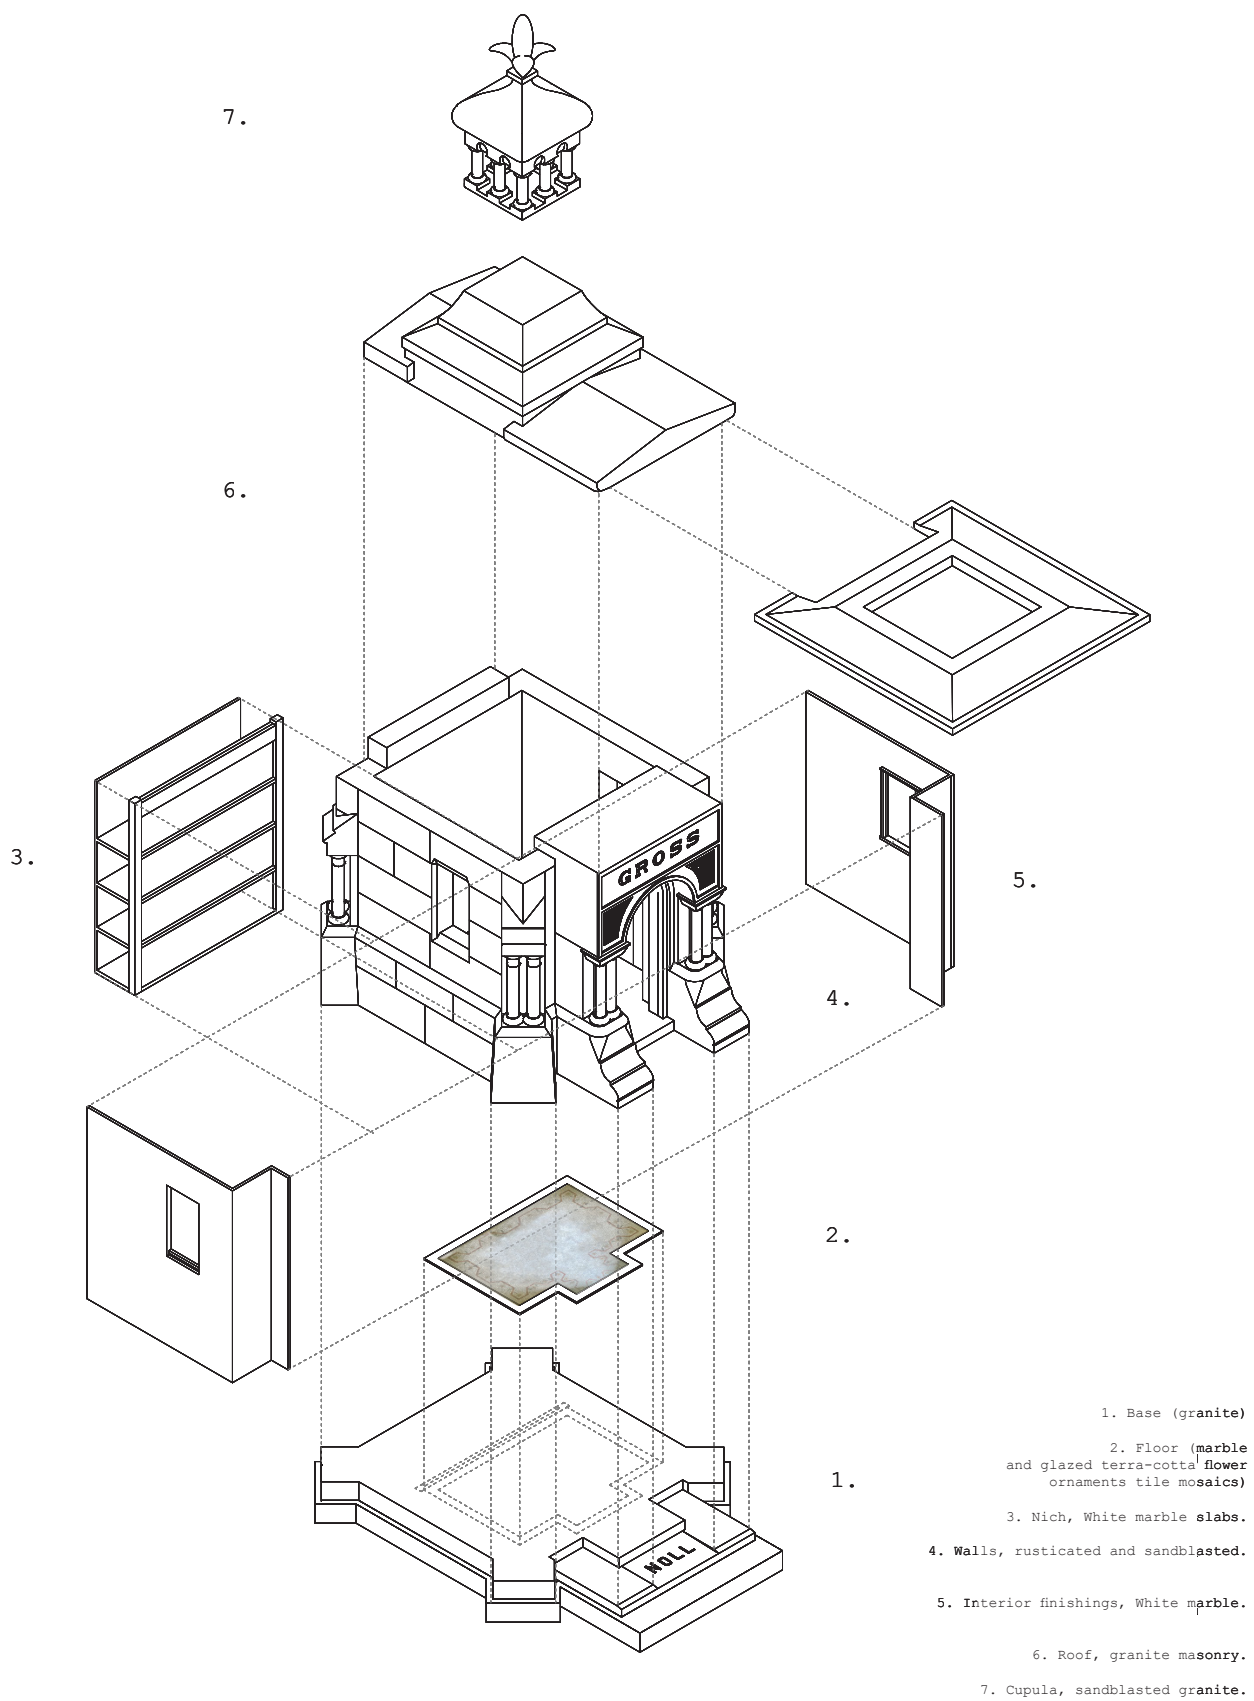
Elevations drawing of the Gross-Noll mausoleum.
